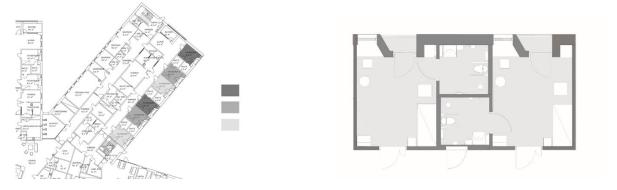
Plan of the ward that will be used in the study. Right: overview of ward. Left: Plan of two én-suite patient rooms. Pictures: White arkitekter.
